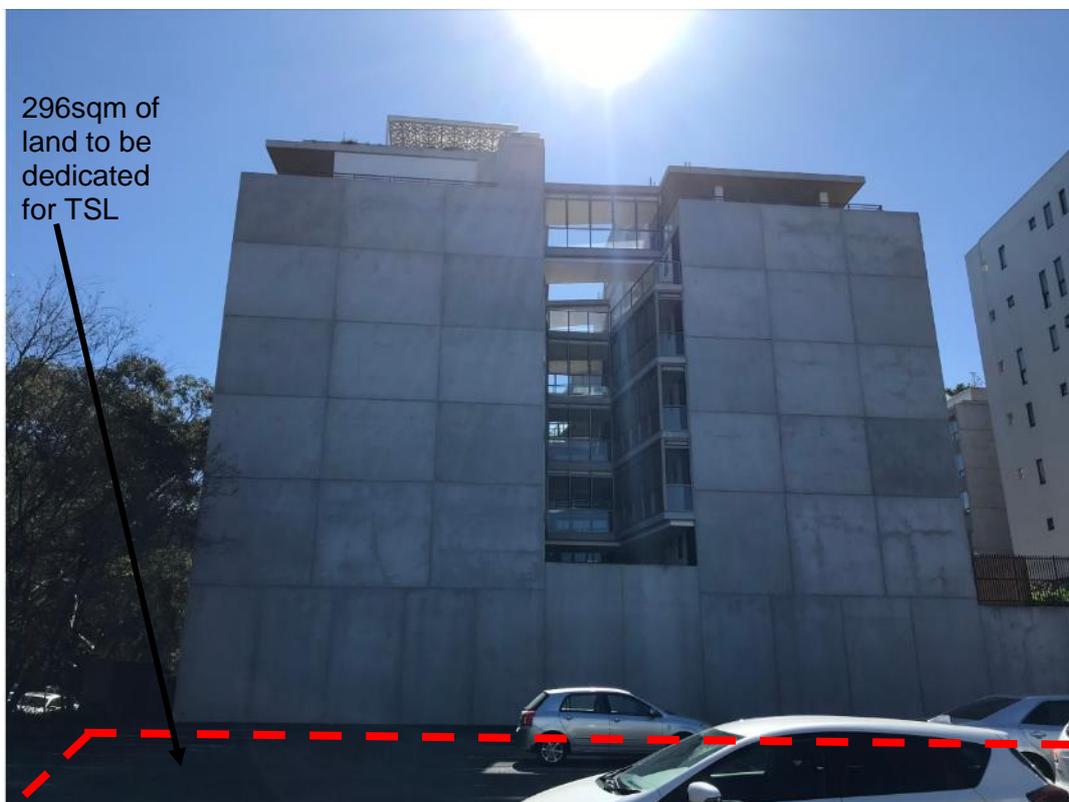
Seven-storey residential flat building at 2 Mentmore Avenue, as viewed from 12-22 Rothschild Ave
